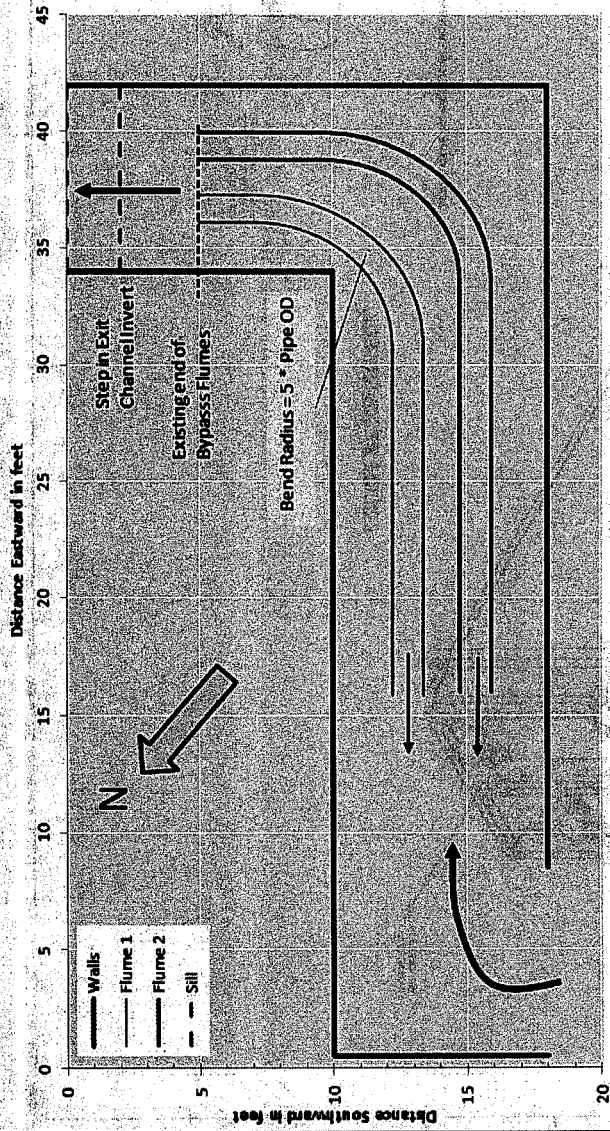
Proposed Extension to Bypass Flumes at 5% Slope (Plan View).
